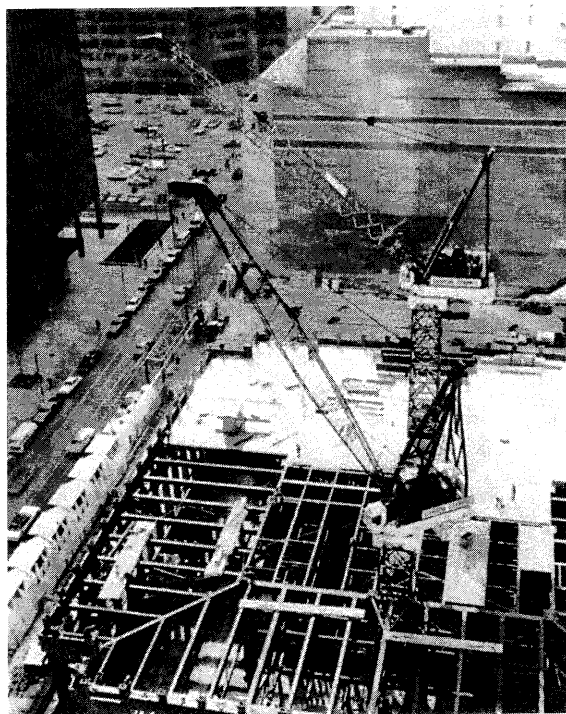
Tower crane erecting steel. (Courtesy of FMC Corporation)
